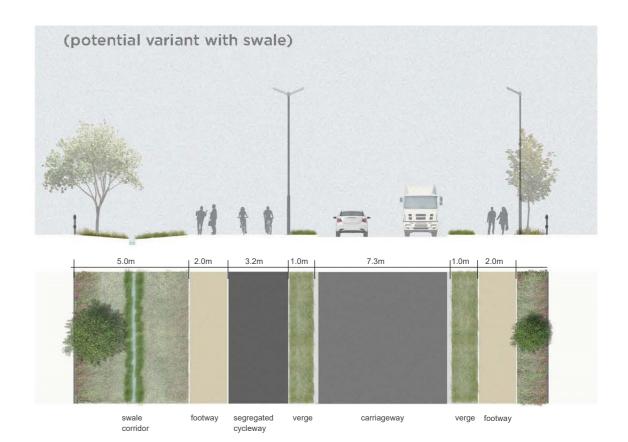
E2 Example Secondary Access Route section – north towards Widnes Road taken from the Development Framework page 117
